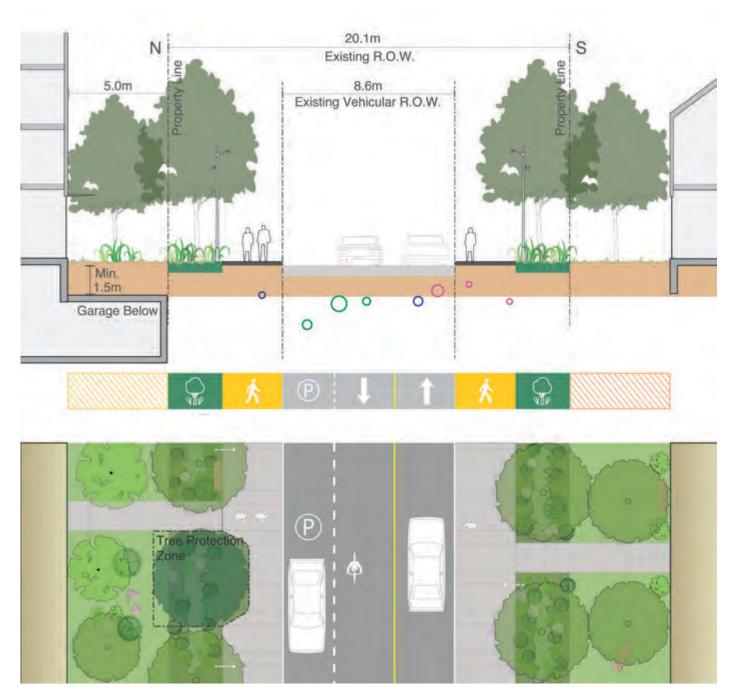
Section and Plan of Soudan Greenway - Recommended Final Condition
